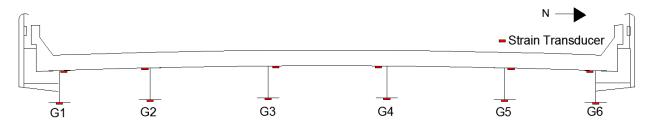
Sioux County Bridge cross-section view of strain transducer locations
